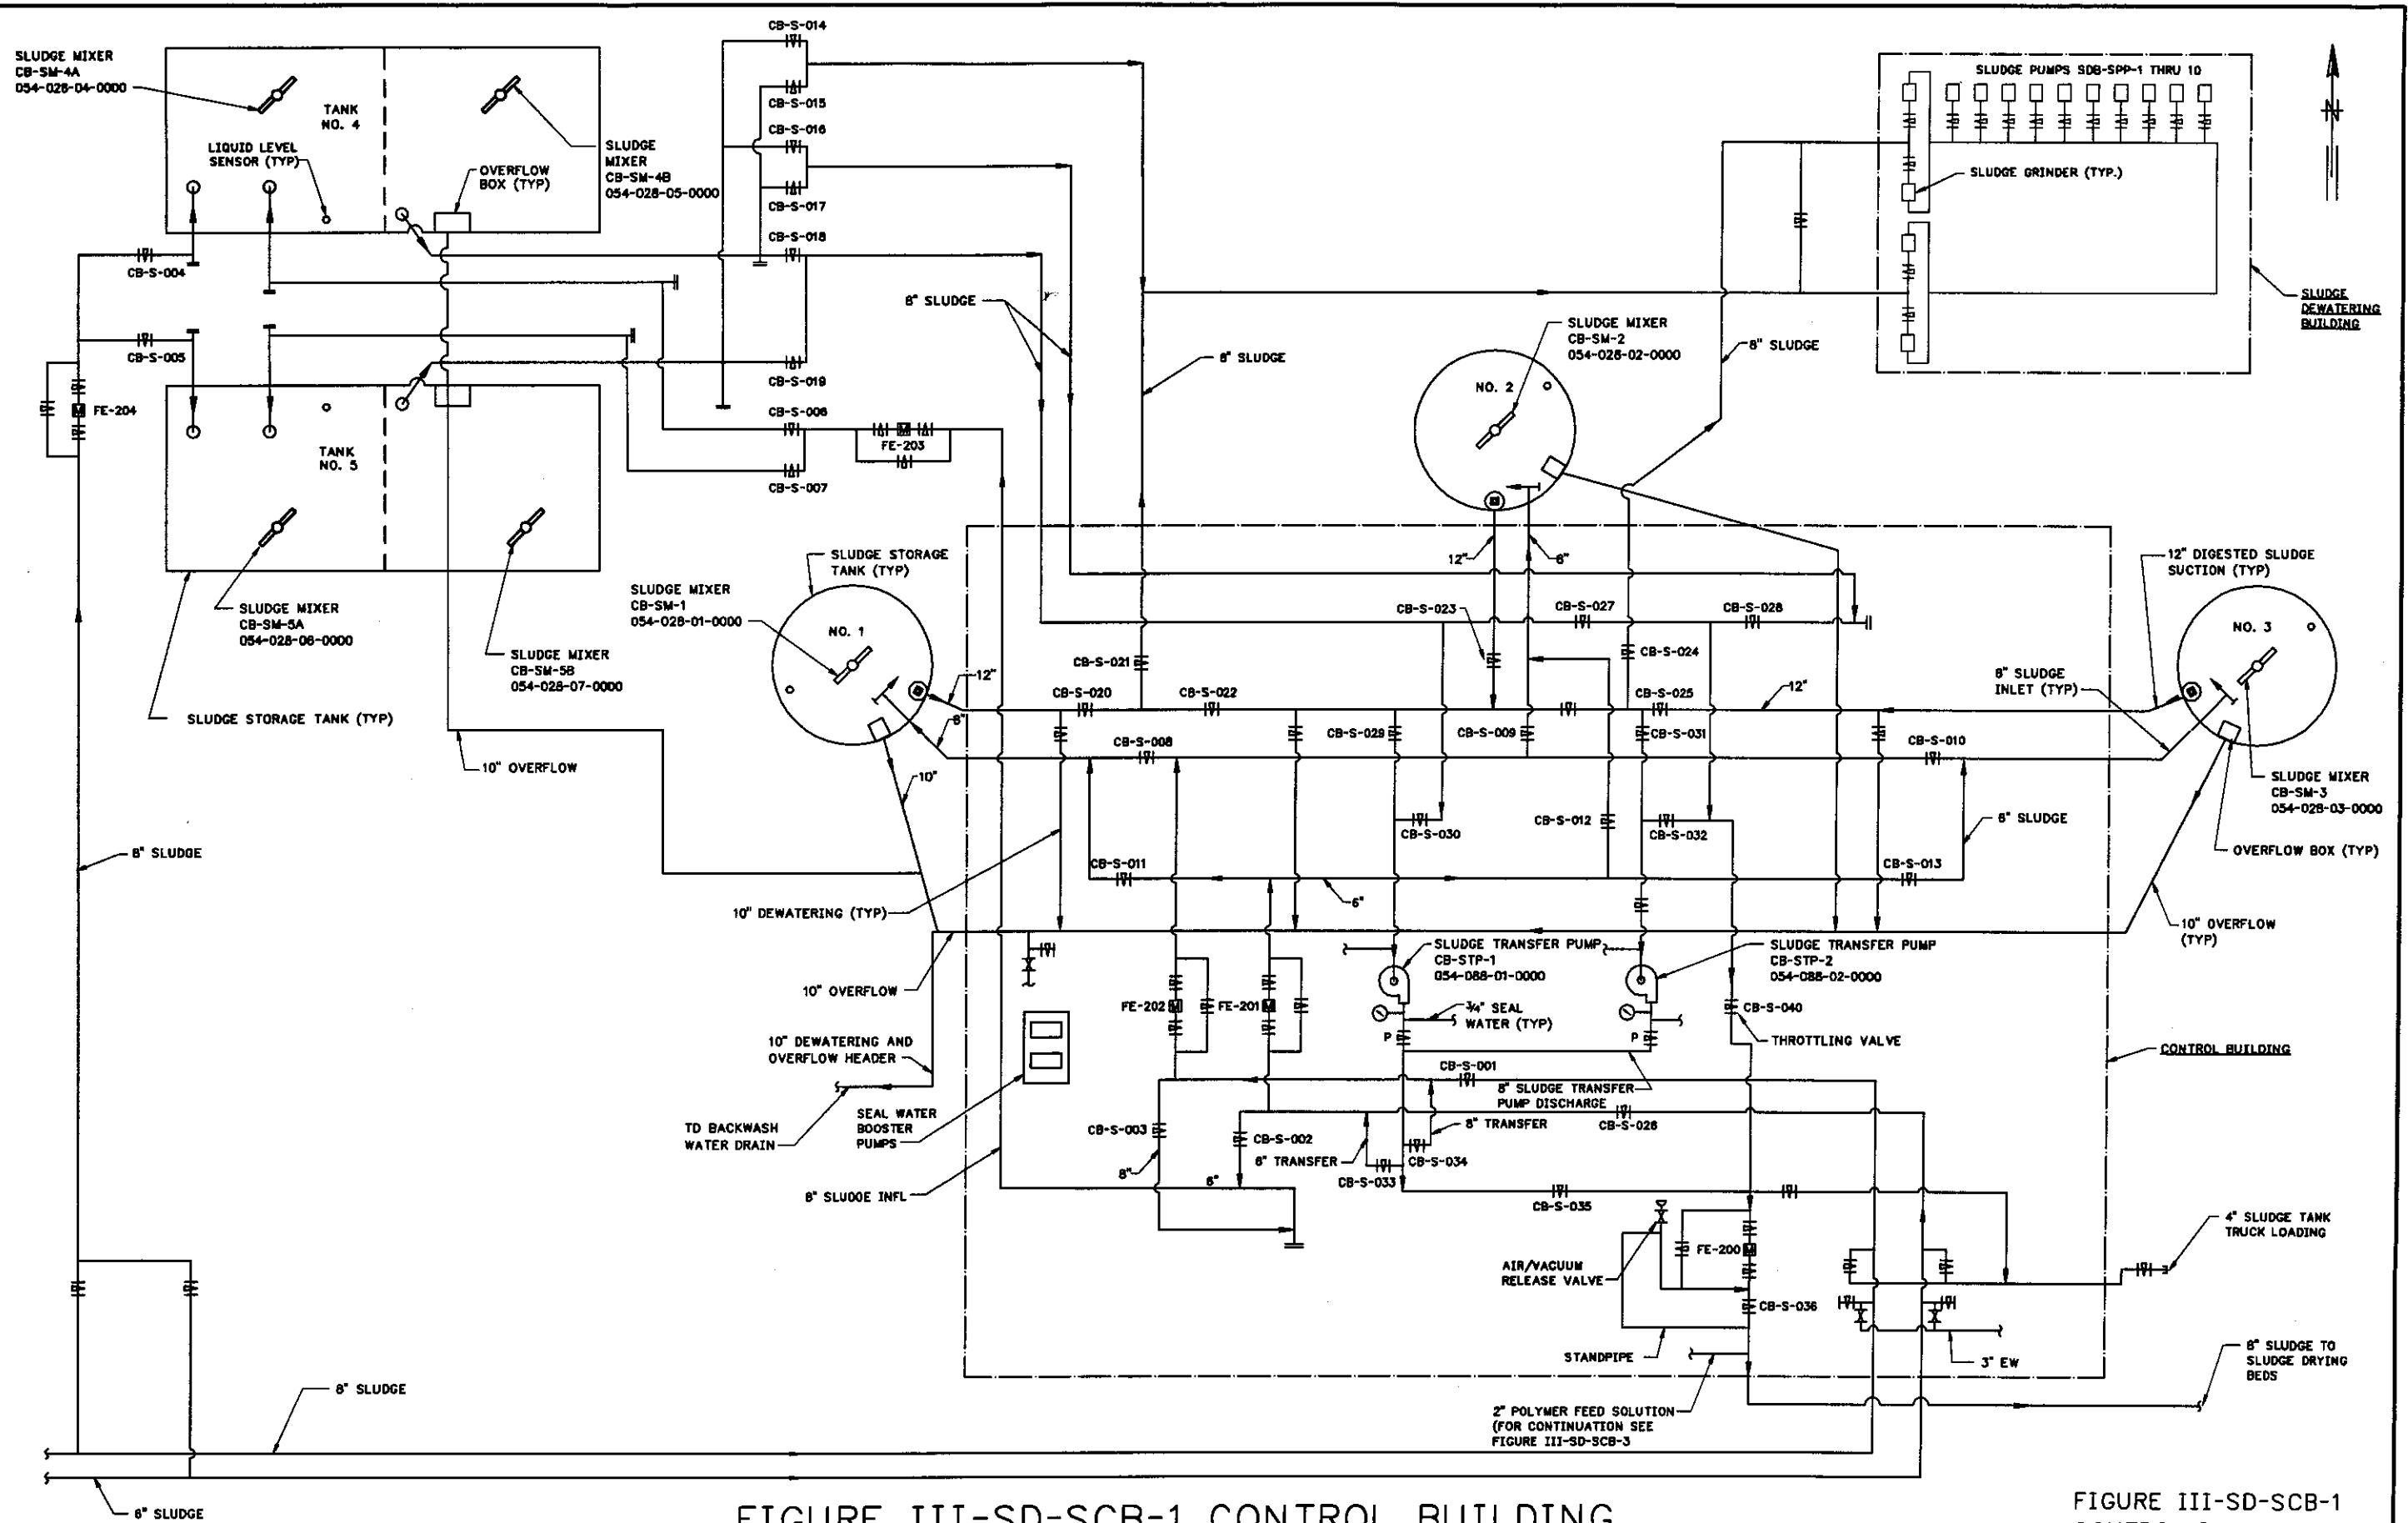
FIGURE III-SD-SCB-1 CONTROL BUILDING AND SLUDGE STORAGE TANKS SCHEMATIC
